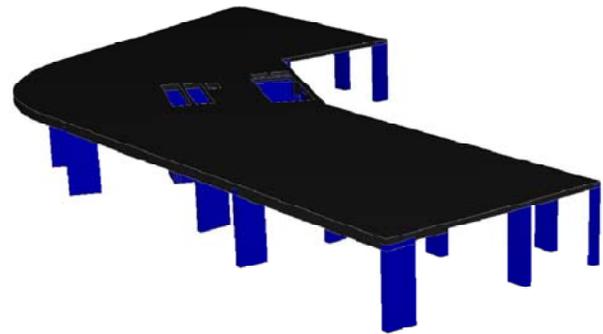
Typical Floor Perspective Modeled in RAM Concept
